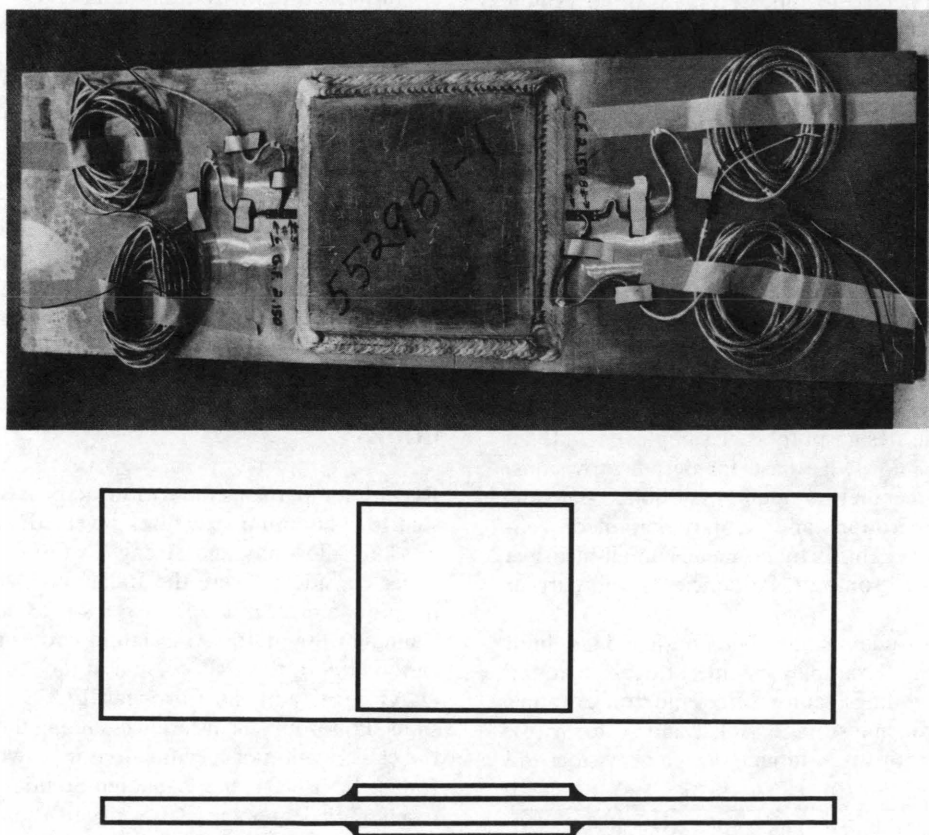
Axial cover-plate specimen: top, photograph; bottom, schematic.
